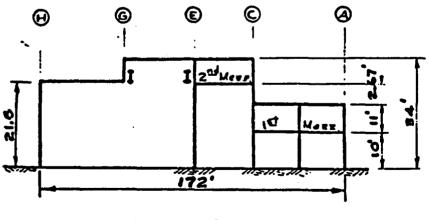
Example of concrete building. (Sheet 1 of 6)
